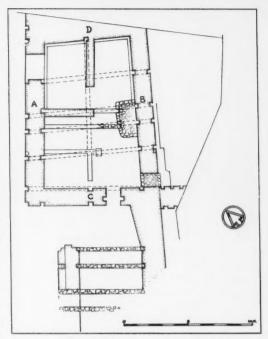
Plan of the burned brick building on the lesser mound. Dotted lines indicate wood construction. Scale in meters.
